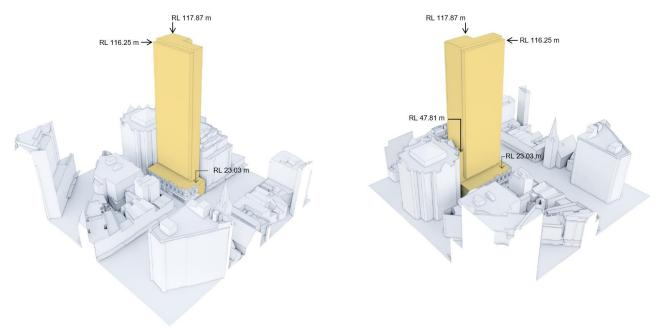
XX 757-763 George Street, Haymarket – Indicative envelope elevations
